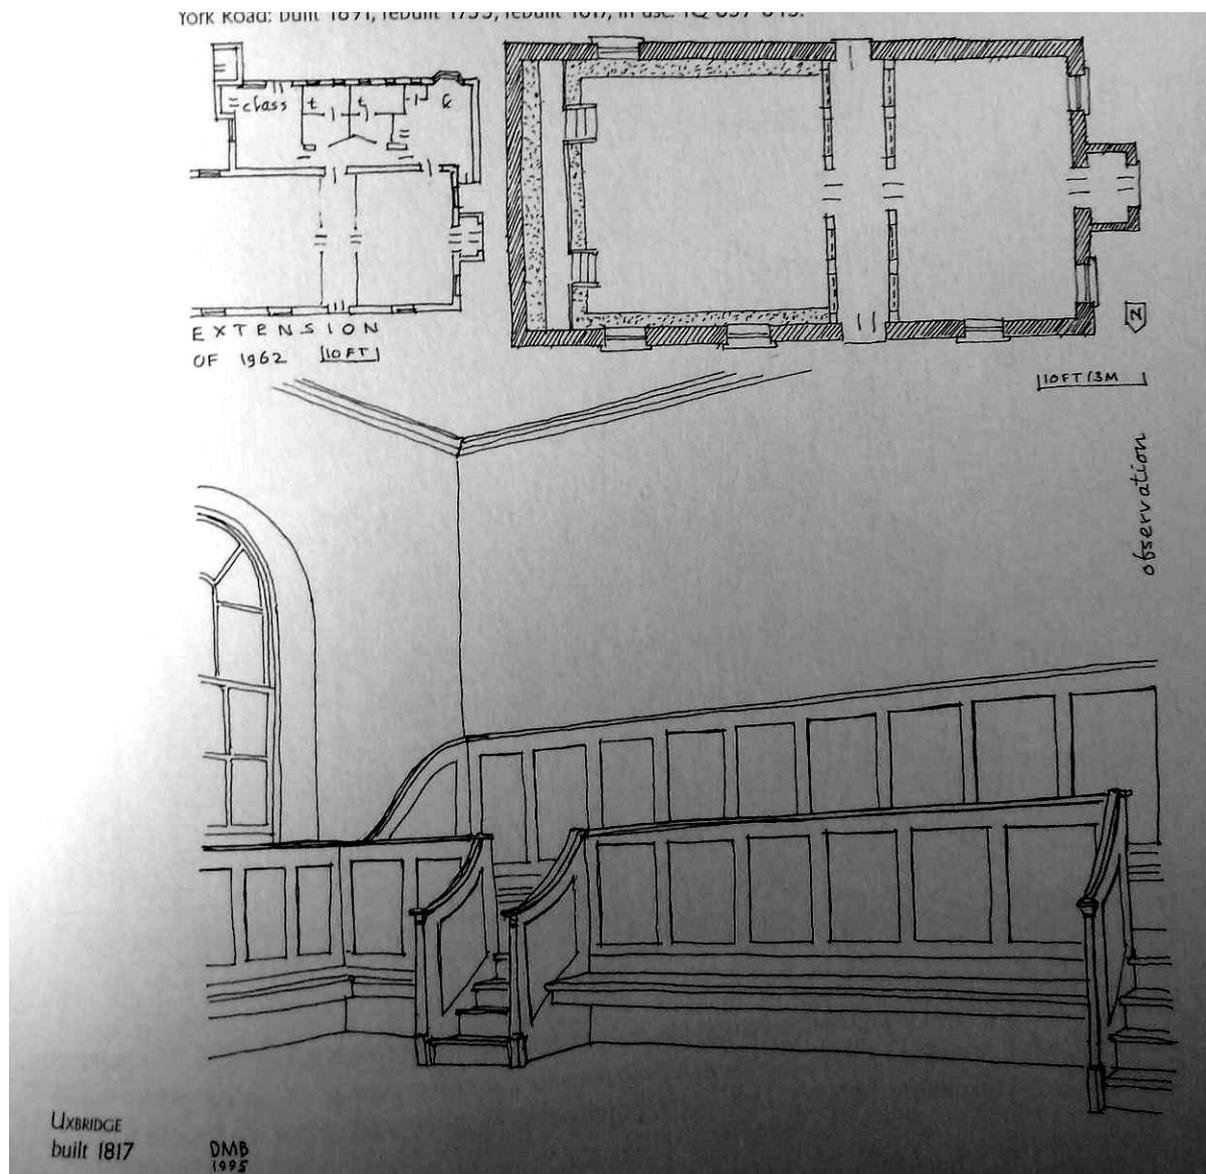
Plan and internal elevation, from Butler Vol. 1, p. 425
